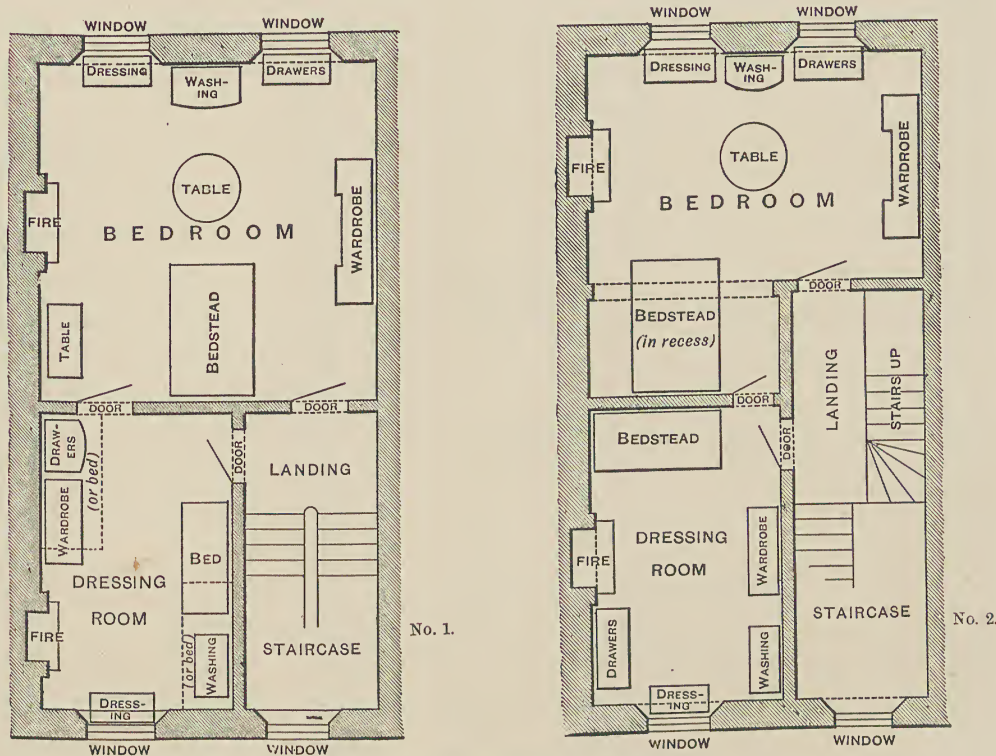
Bedrooms and Dressing-rooms in Street House.
